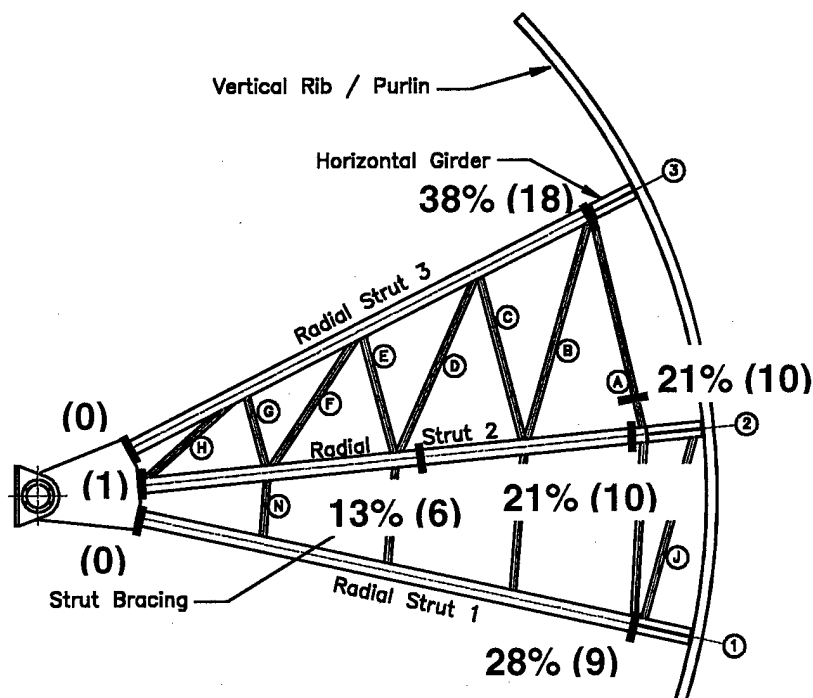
Ultrasonic Weld Test Locations and Percentage of Welds Failing Testing at Each Location.
